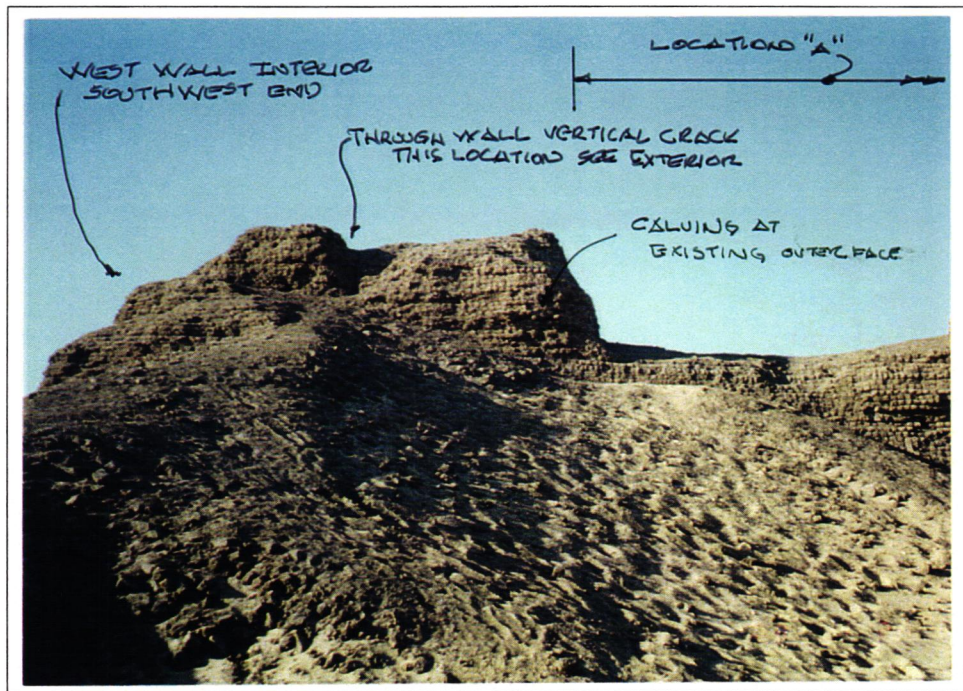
West Main Enclosure Wall South End Upper Surface
